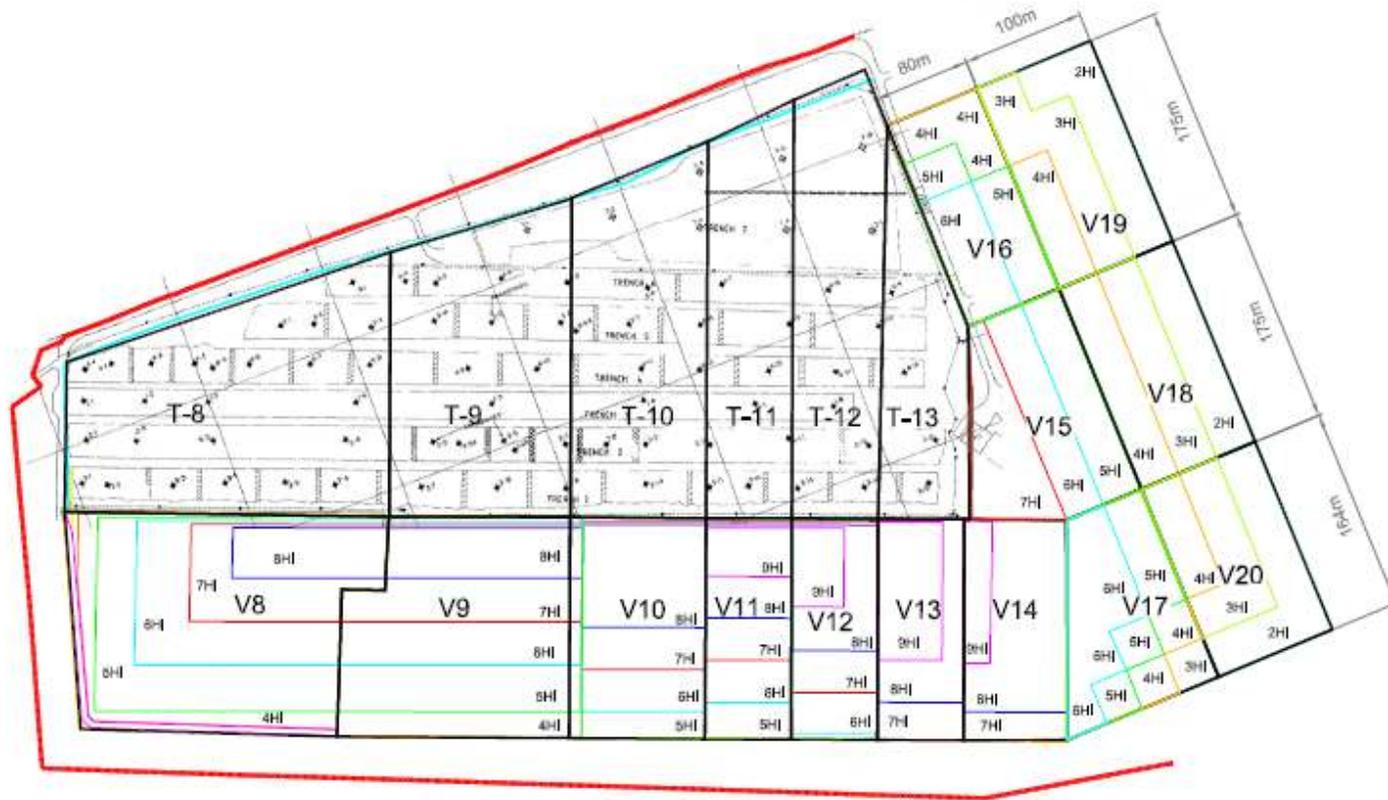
Layout of the extended facility, showing the six additional vaults (Vaults 15 to 20)
